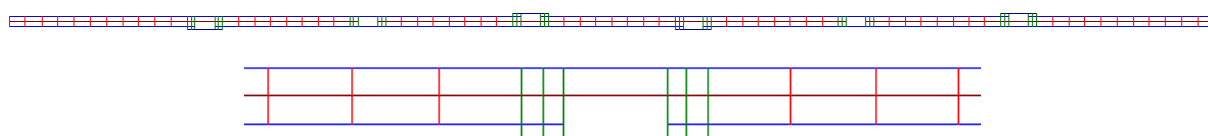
Detailed Model of Old PWD Laminated Timber Bottom Chord (with Splice Detail)
